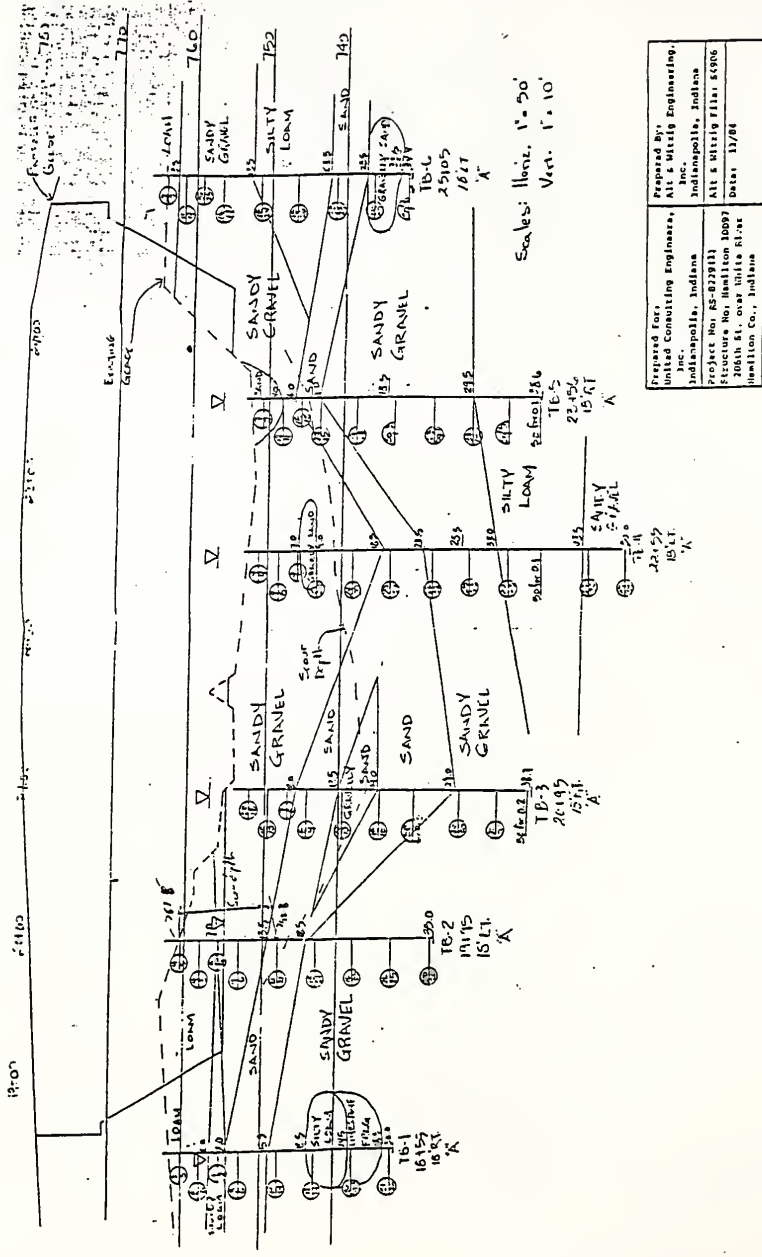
Generalized subsurface conditions at site of bridge structure (East 206th street bridge over White river)
